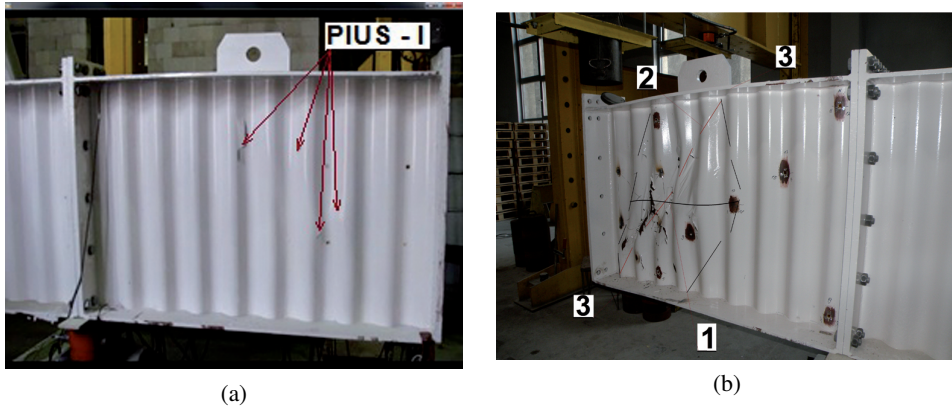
Stages of failure mode of SIN girders with cantilever: a) initiation points for the instability of the (PIUS-I) girder web M 2.32 (1000 × 2.5), b), final failure mode of the girders M 2.32 (1000 × 2.5)
